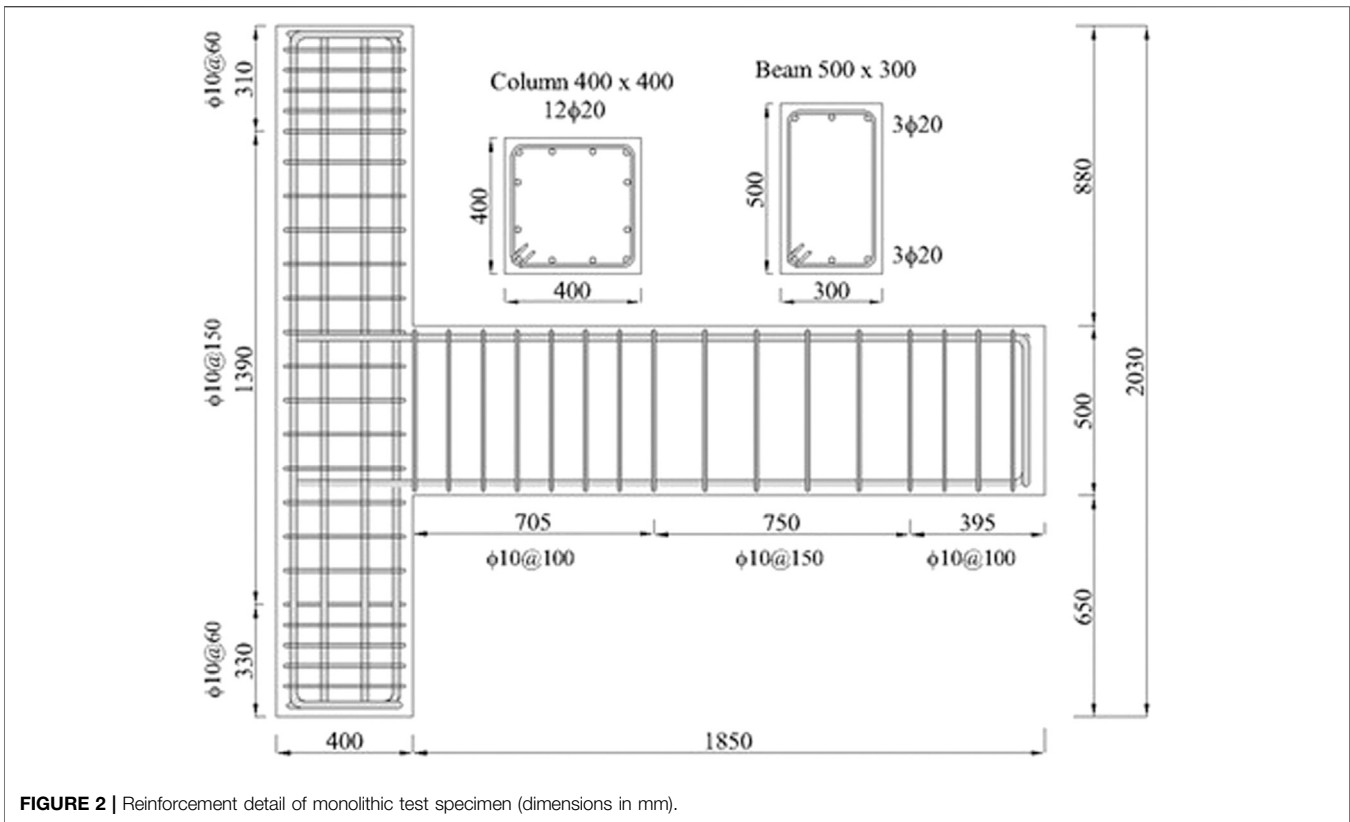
| Reinforcement detail of monolithic test specimen (dimensions in mm).
